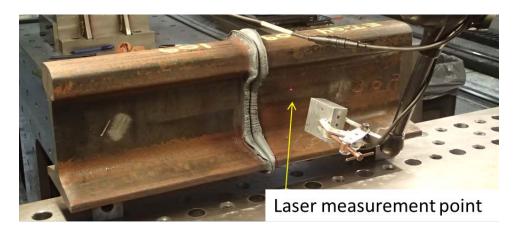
Weld 109 Web Being Laser Scanned for Alignment
